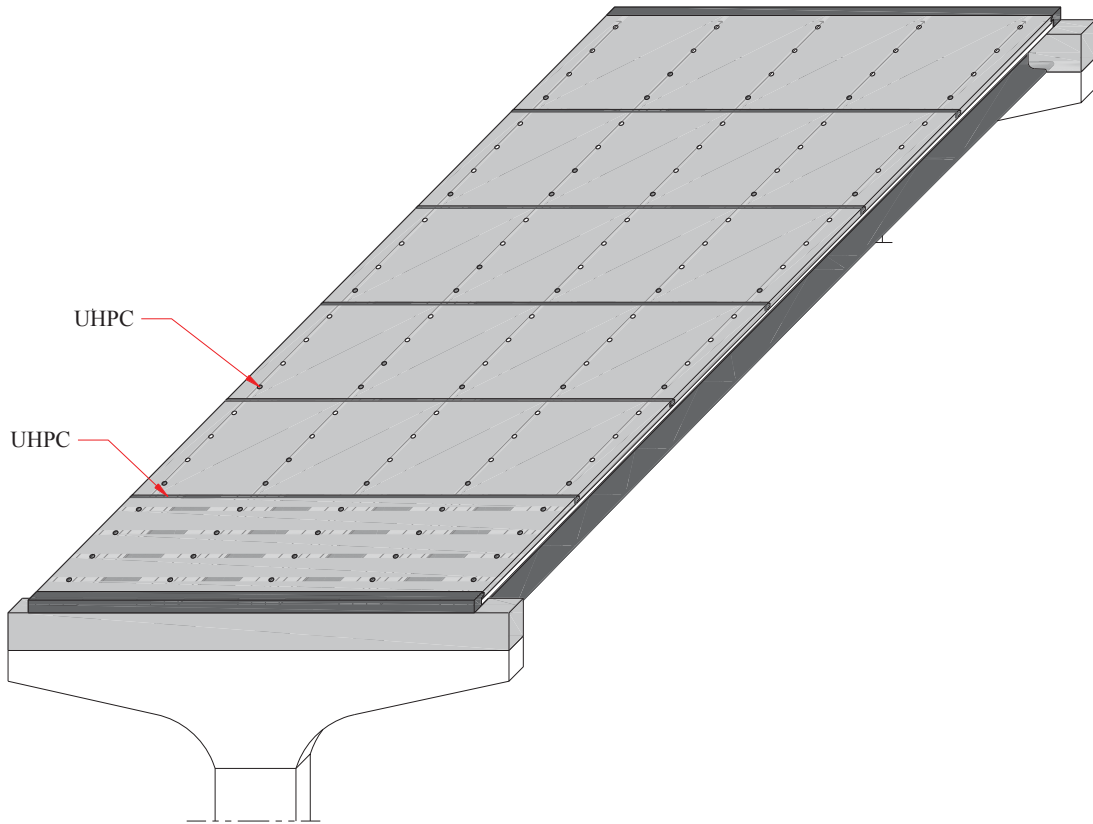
Construction Sequence of the Proposed Precast Concrete Deck-to-Concrete Girder Connection Using UHPC
